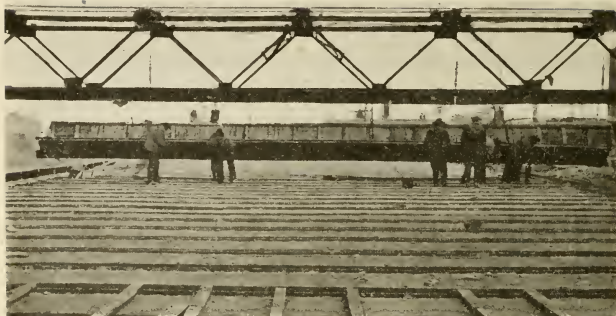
CASTING YARD FOR CONCRETE PILES.
